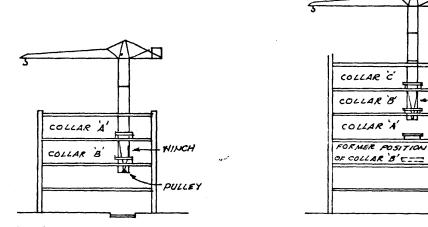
(LEFT) CEANE DETACHED FROM FOUNDATIONS, LIFTED THROUGH COLLDRS WITH HAND WINCH AND REFIXED
